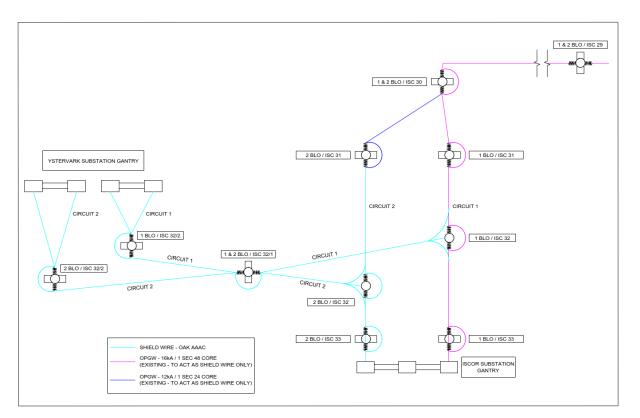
Structure Earthing and Shield Wire/OPGW Gantry Bonding Configurations - Plan View
